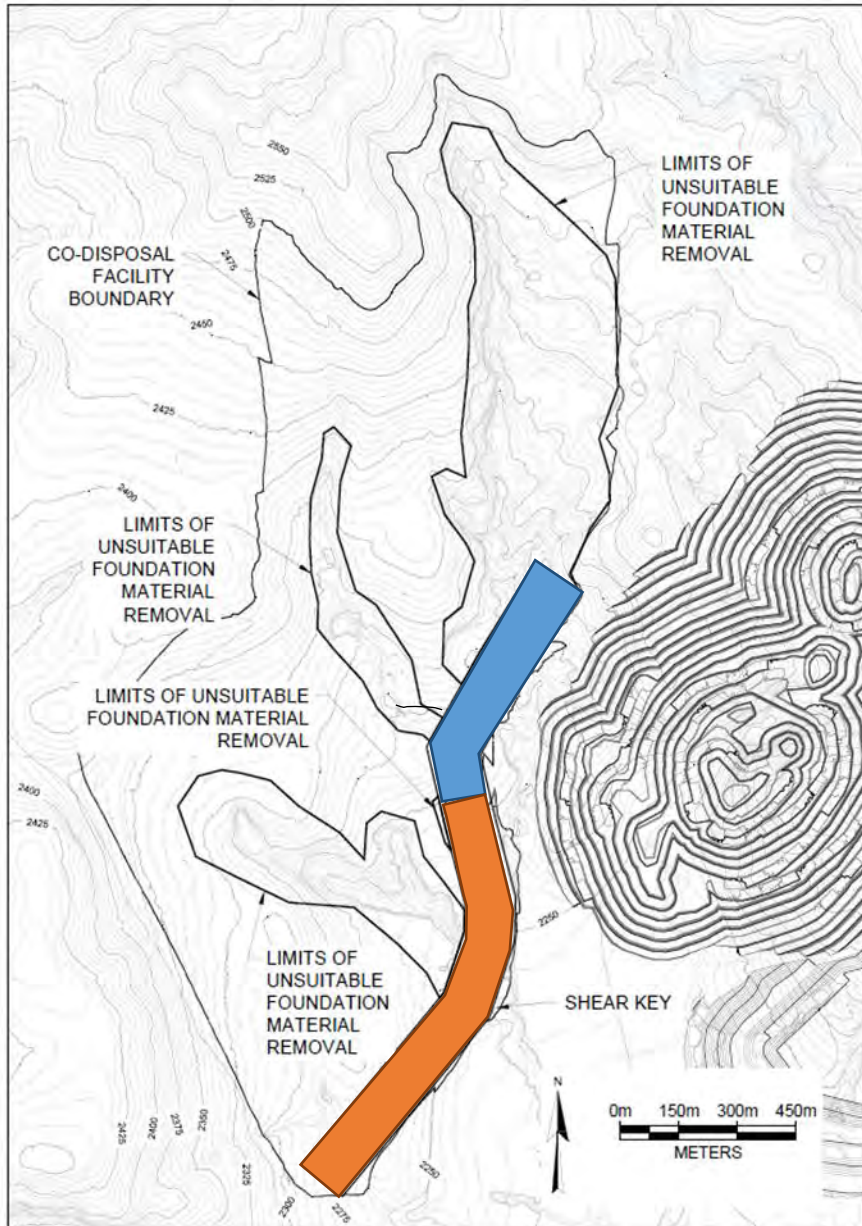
West Tailings and Rock Storage Facility Foundation Preparation Author SRK, 24 January 2019.
